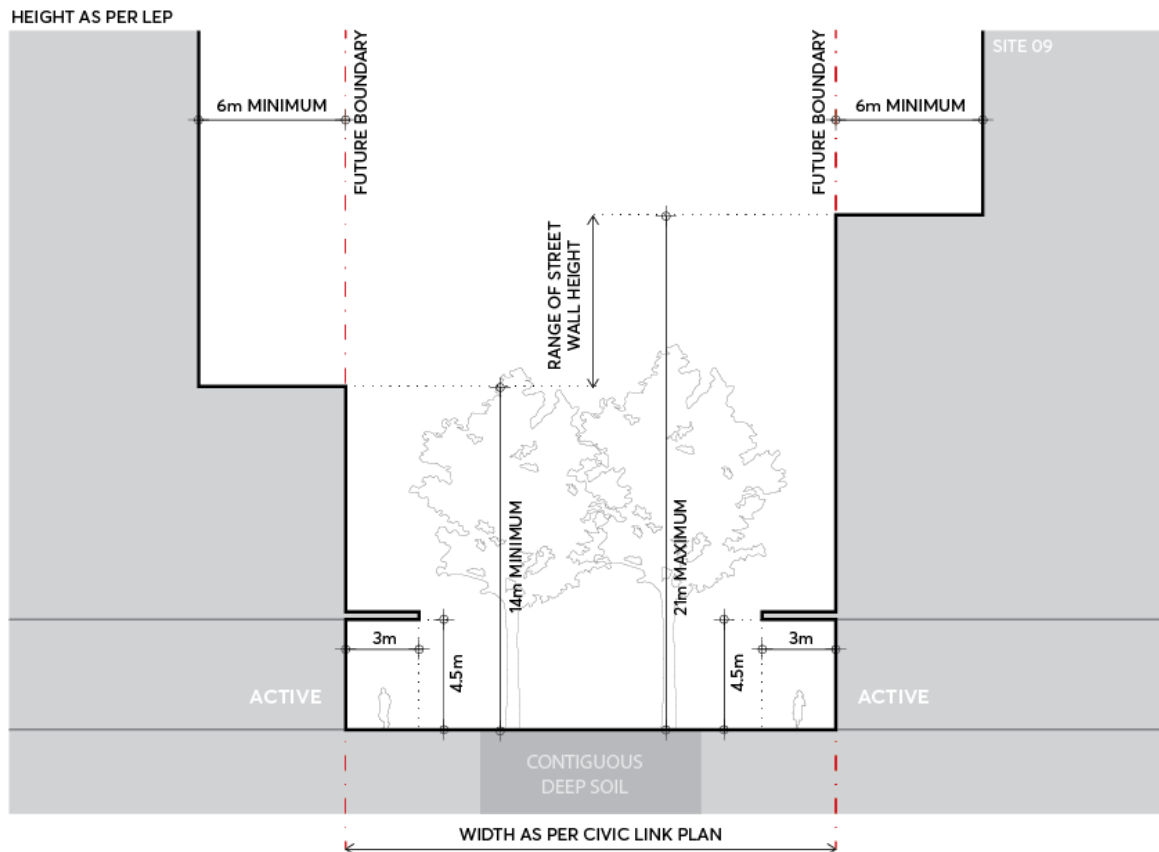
Future Civic Link in Block 3 (Section H) Setback & Building Height
